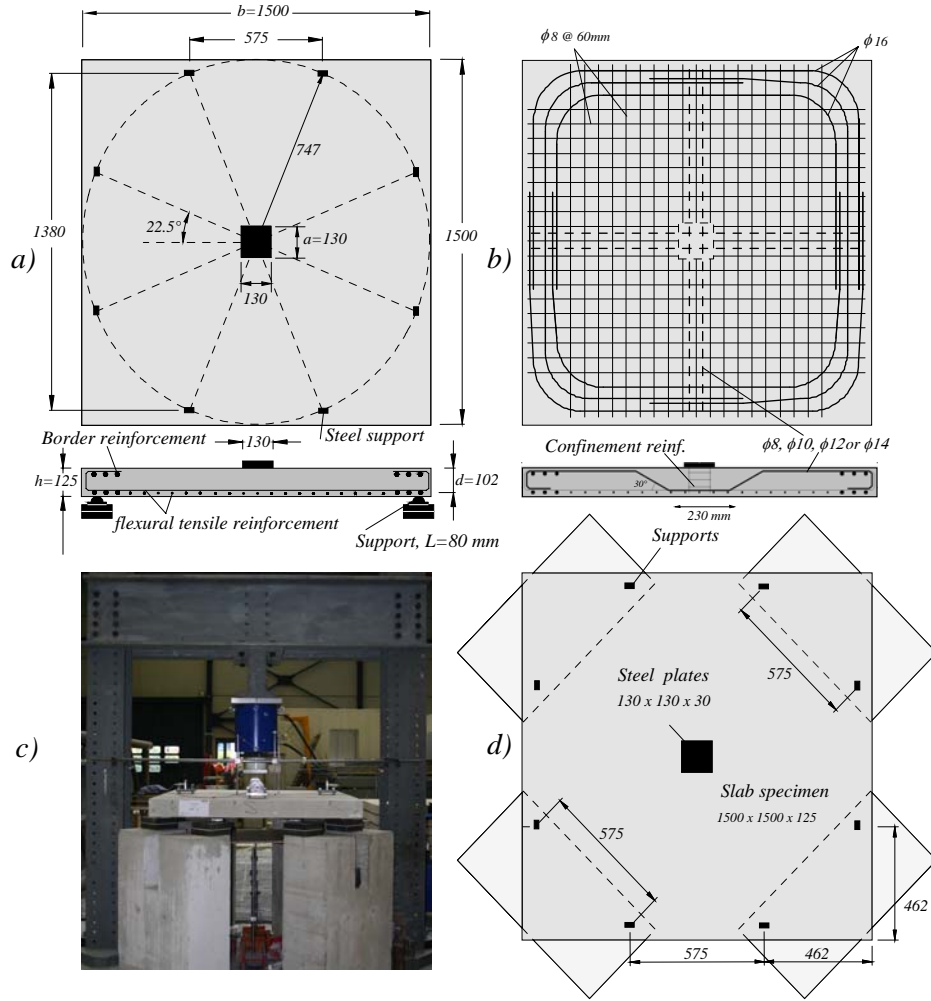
Reinforcement arrangement and test setup: a) typical slab plan and section (PM-3), b) reinforcement layout for PM-17 to PM-20, c) test setup, and d) test setup, plan view [mm]⁹
